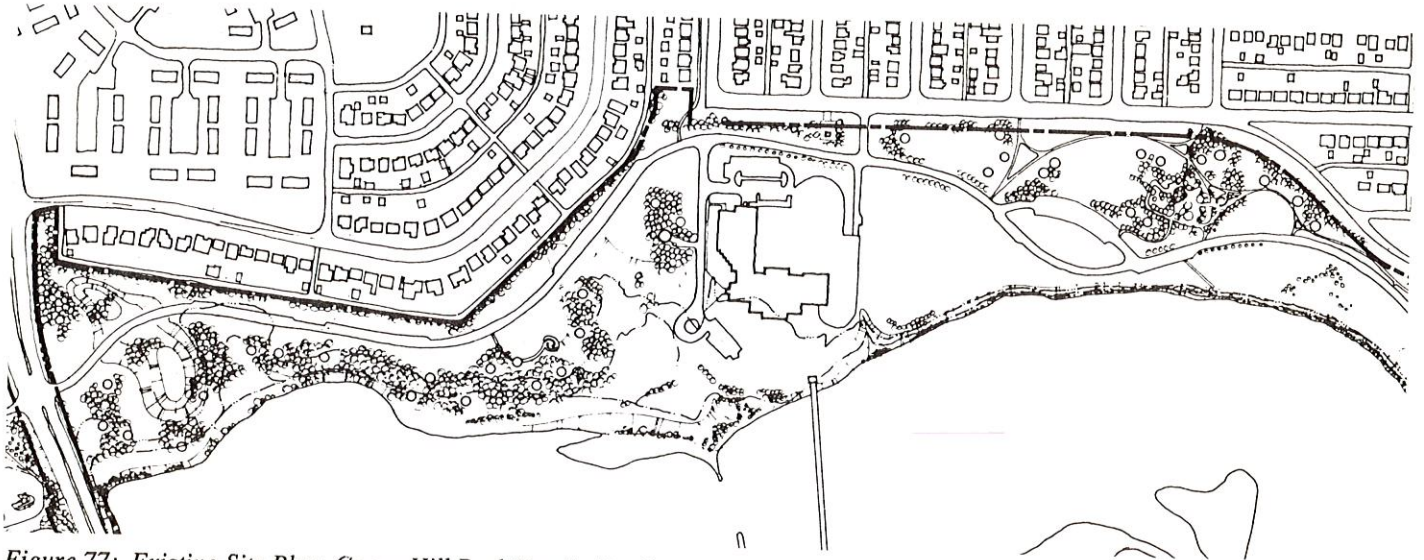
Existing Site Plan, Goose Hill Park/Family Parkland
